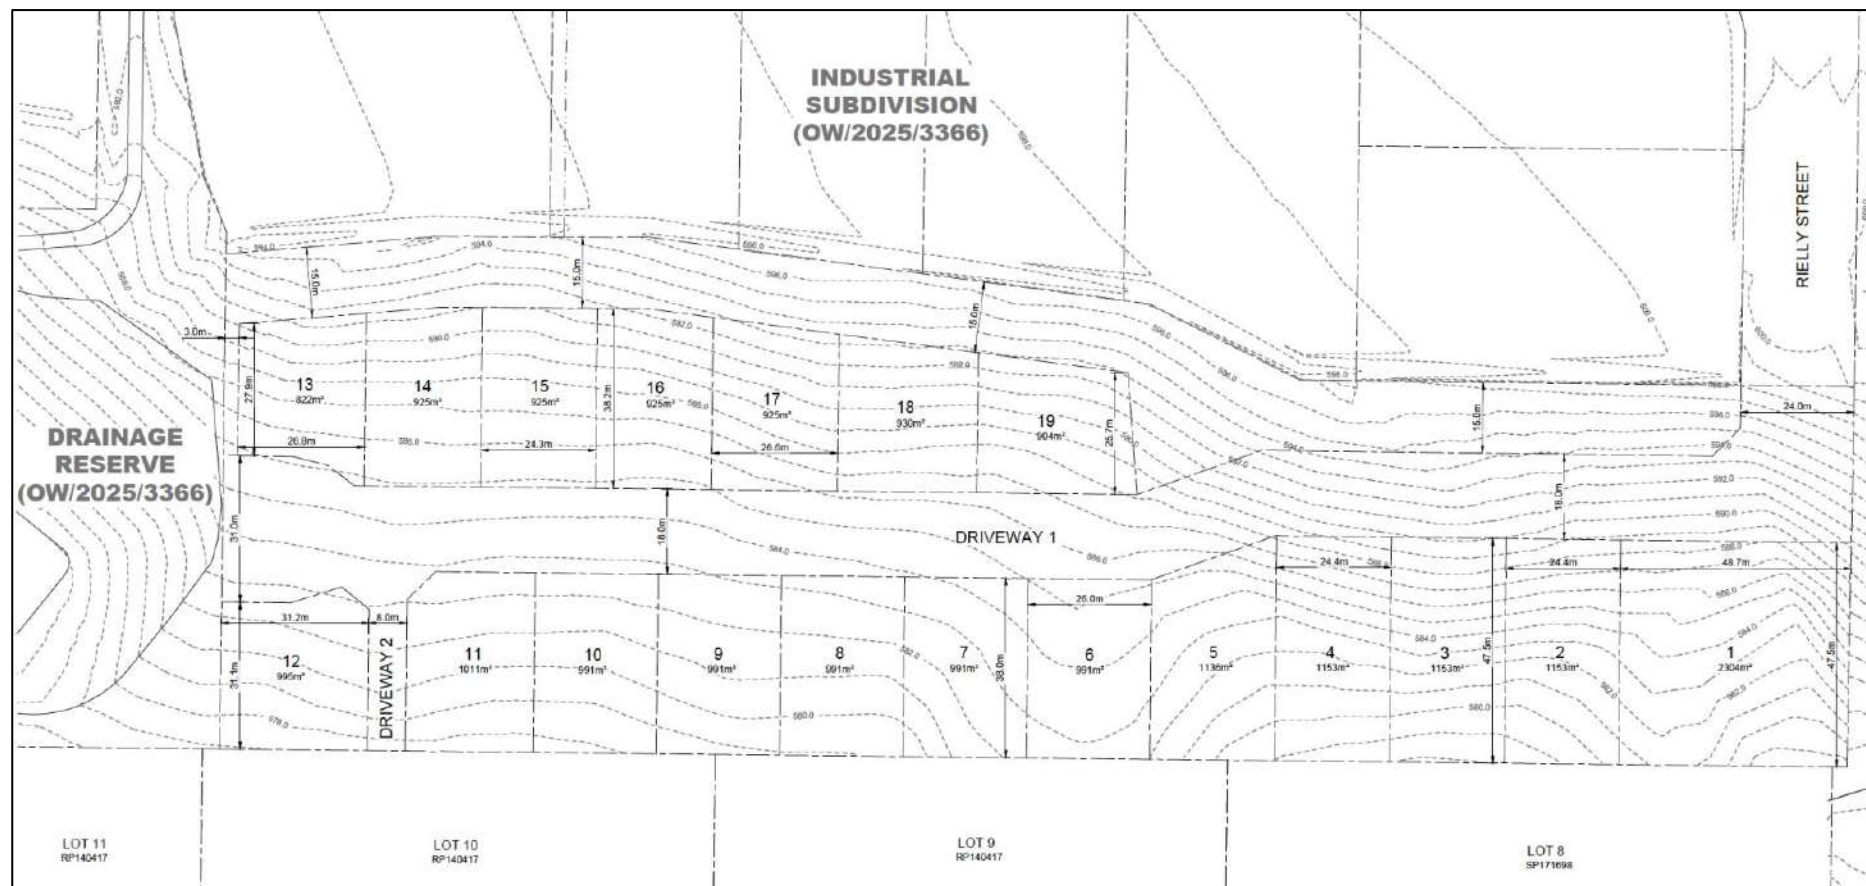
PRELIMINARY LOT LAYOUT PLAN
